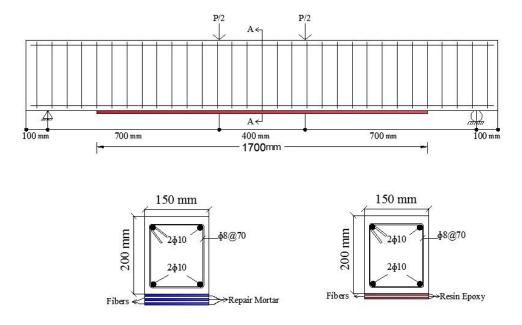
The dimension, longitudinal and transverse reinforcement arrangement and the location of the applied loads (the dimensions are based on mm) of (a) the specimen strengthened with CFRP and epoxy resin and (b) the specimen strengthened with CFRP and cement-based mortar
